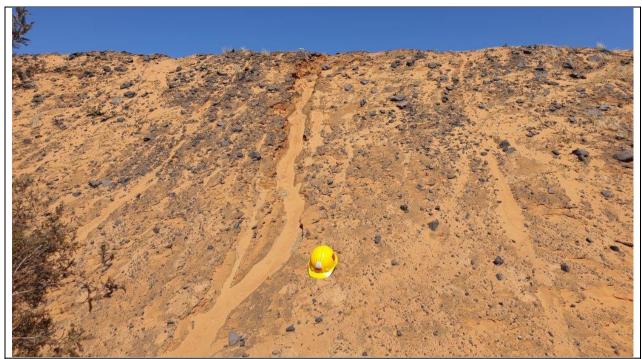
Erosion outside at Nchwaning 2 subsoil stockpiles from construction of the new TSF.
